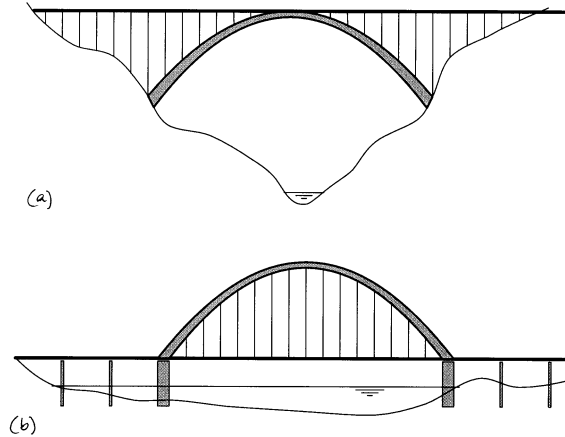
(a) Arch bridge with upper deck. The horizontal forces in the arch are directly transferred to the foundation. (b) Arch bridge with lower deck. The horizontal forces from the arch are transferred via the structure of the bridge deck, which acts as a tie rod.
